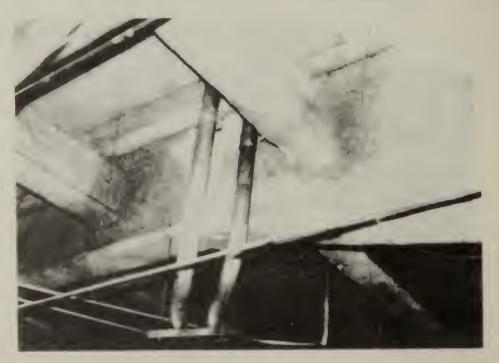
Damage to fireproofing on structural steel due to HVAC system modifications
